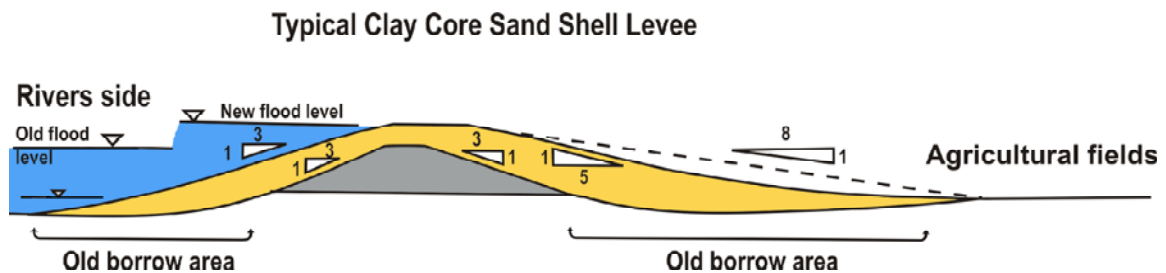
Typical clay core sand shell levee cross-section (Rogers 2009)
